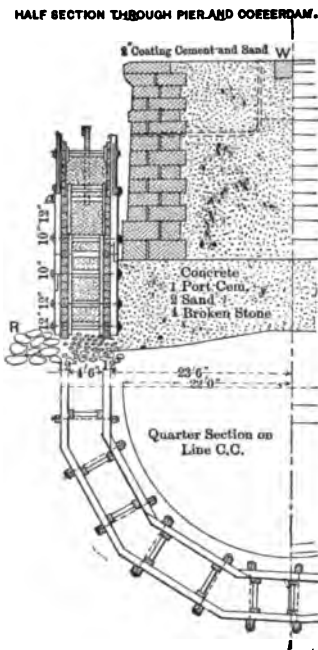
POLYGONAL COFFER-DAM, HARLEM SHIP-CANAL DRAWBRIDGE.
